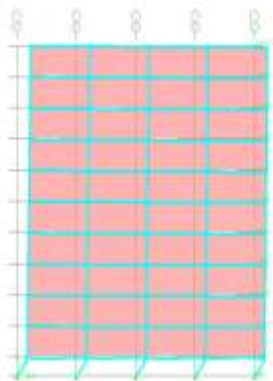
Model 4: G+10 RC first soft storey building with slab element lateral displacement
